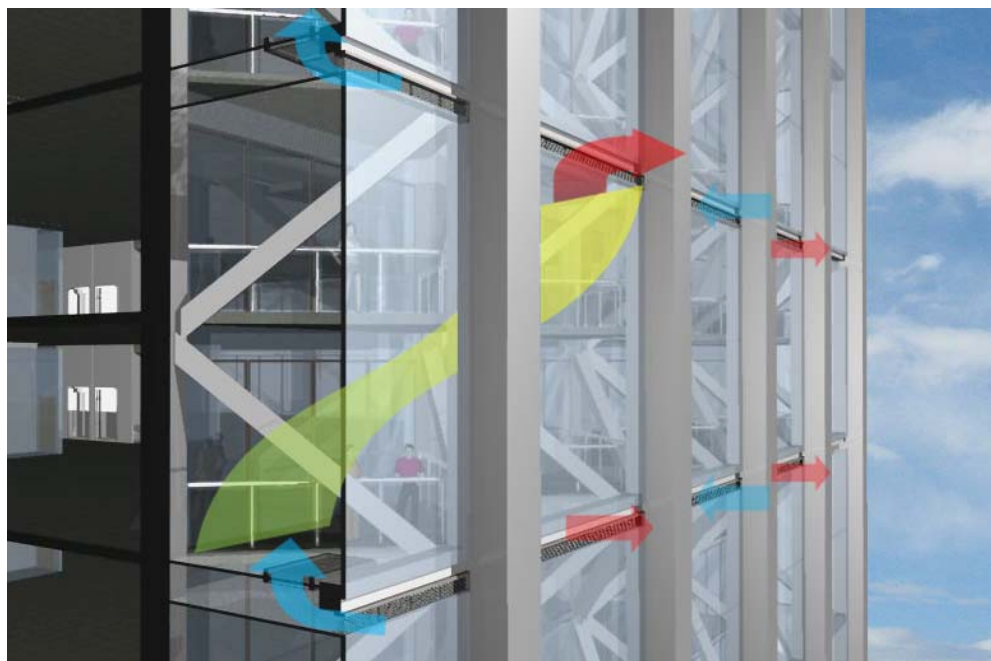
Air circulation in corridor façade of the double-layer space structure building
